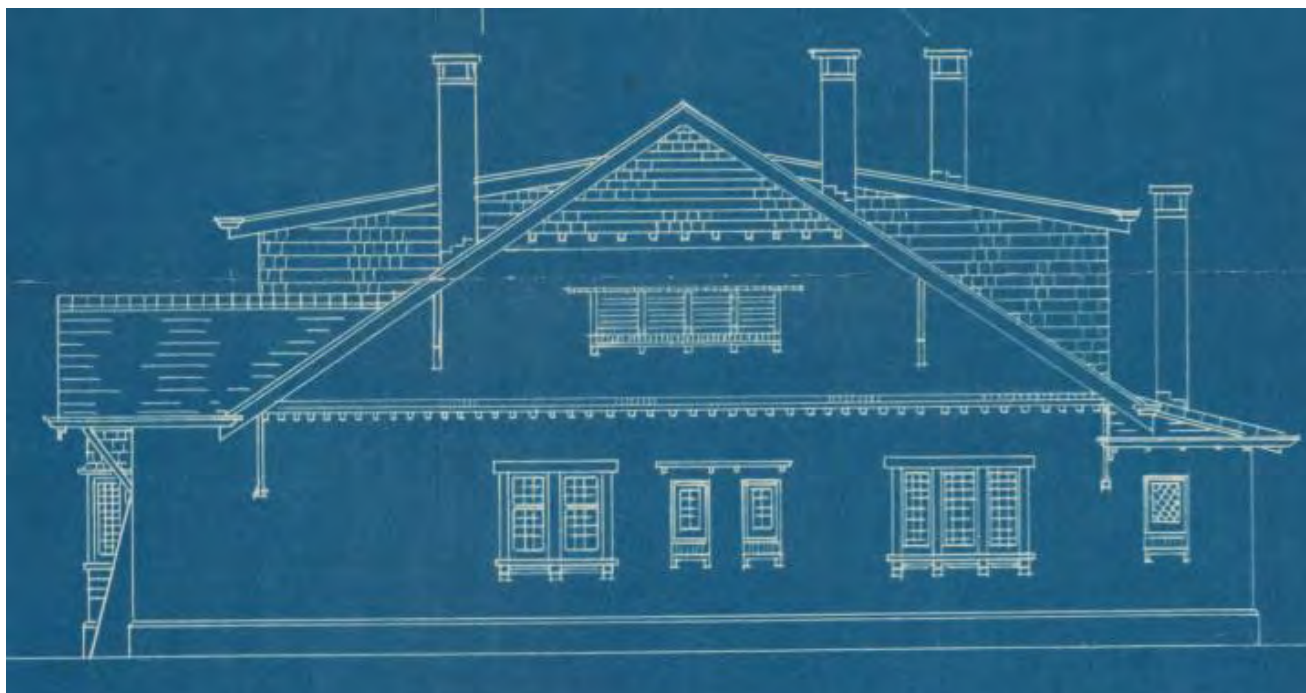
Plan of villa residence for E. Shephard Esq, Normandy Road, St. Kilda (north elevation).
